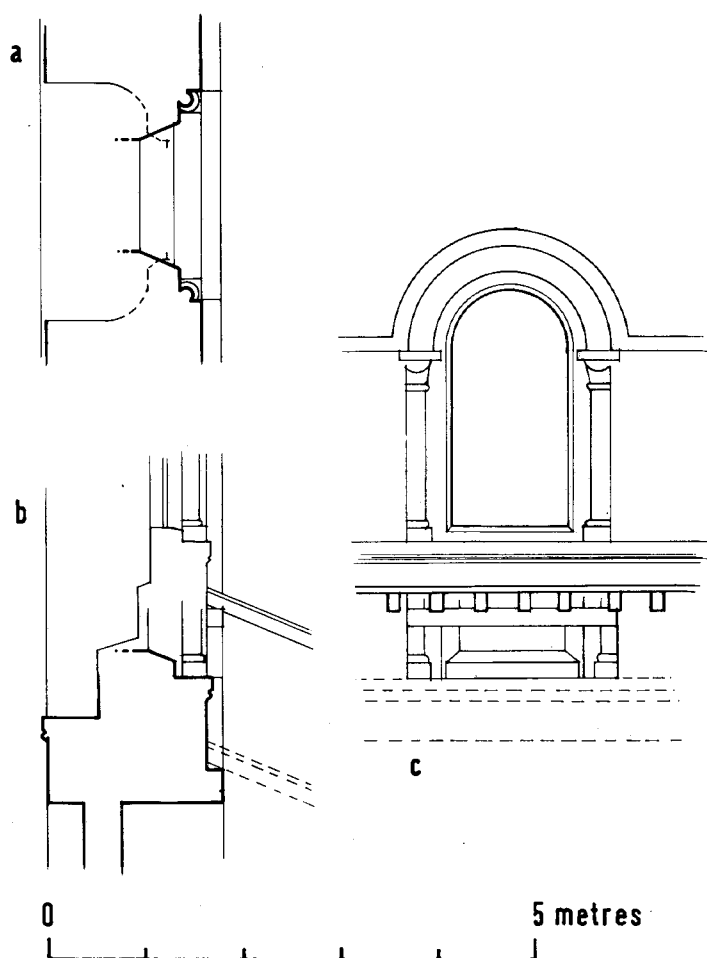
Durham Cathedral: Hidden window sills and jambs of clerestory below Quire Aisle roofs. (a) plan, (b) section, (c) elevation with older sill level below present roof.
